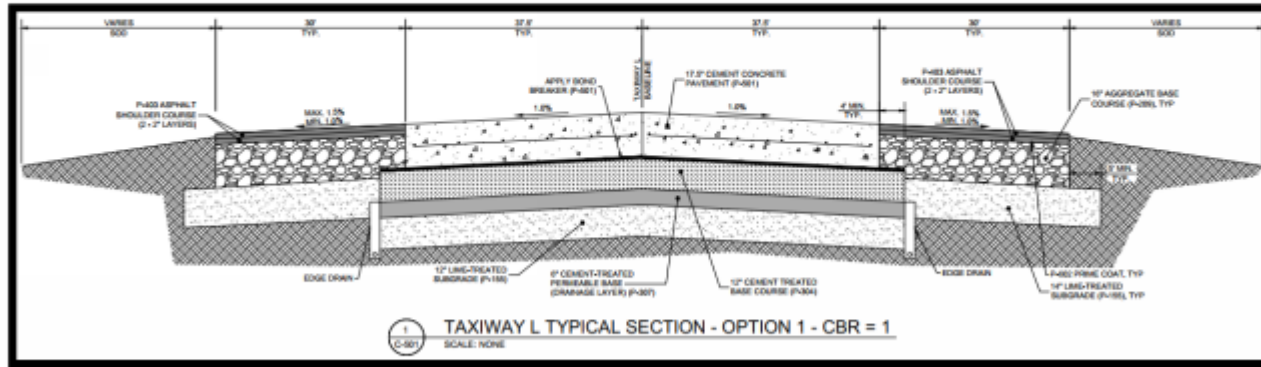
Typical Taxiway and Paved Shoulder Section – Option 1 – CBR = 1.
